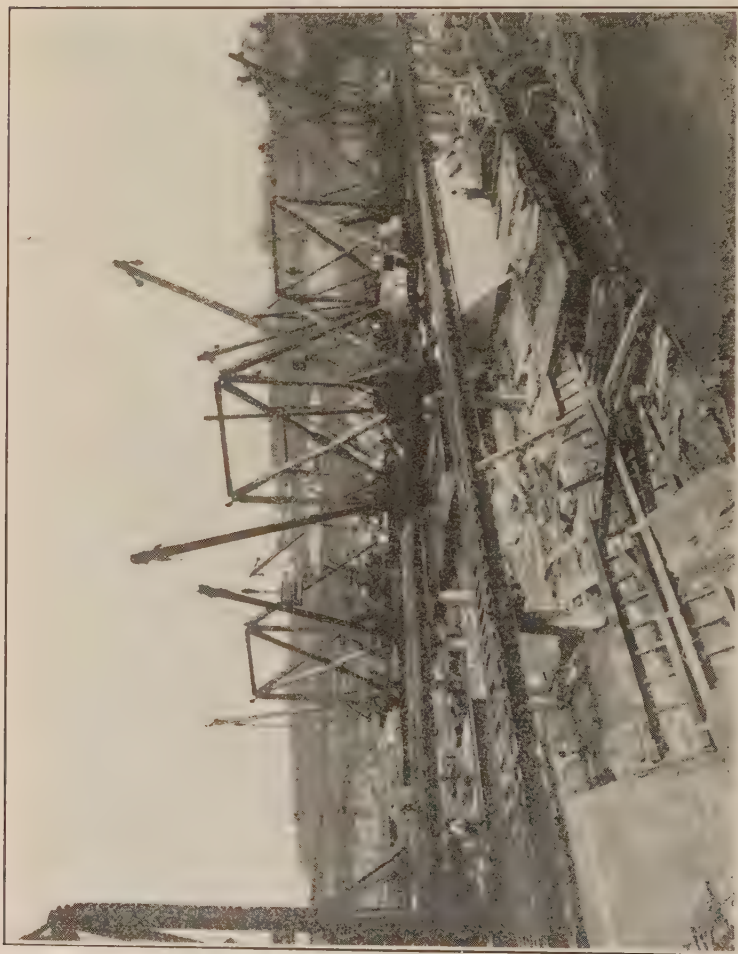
CONSTRUCTION OF SECTION 7, FIRST LIFT.
